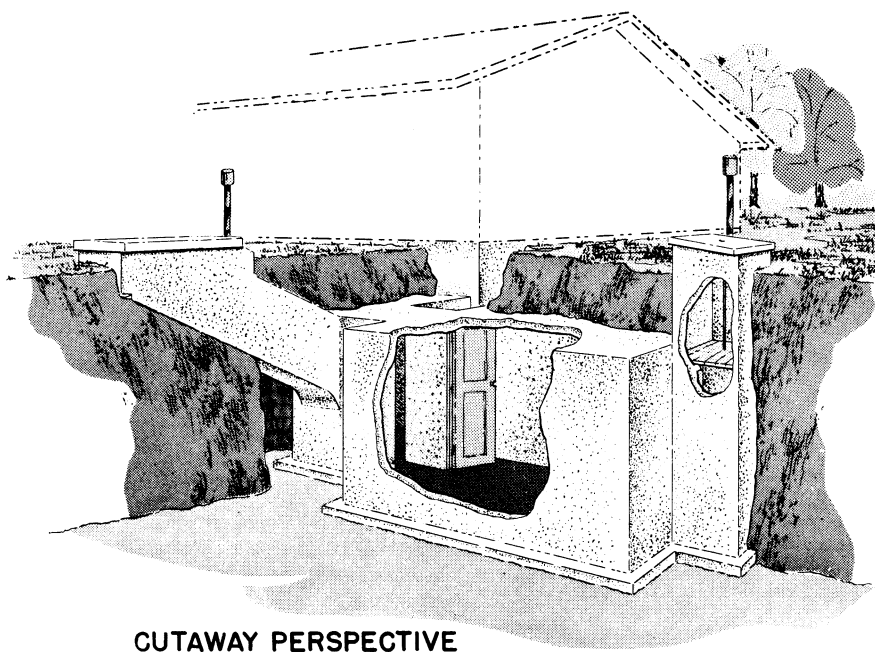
Fallout shelter and storage. (Plan No. 5934.)
